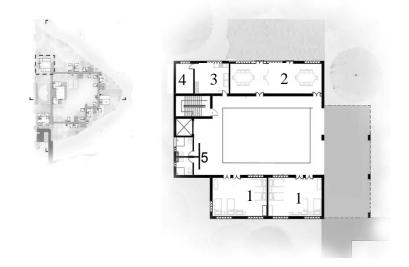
Blow up plan of stuff accommodation block; Source: Author
